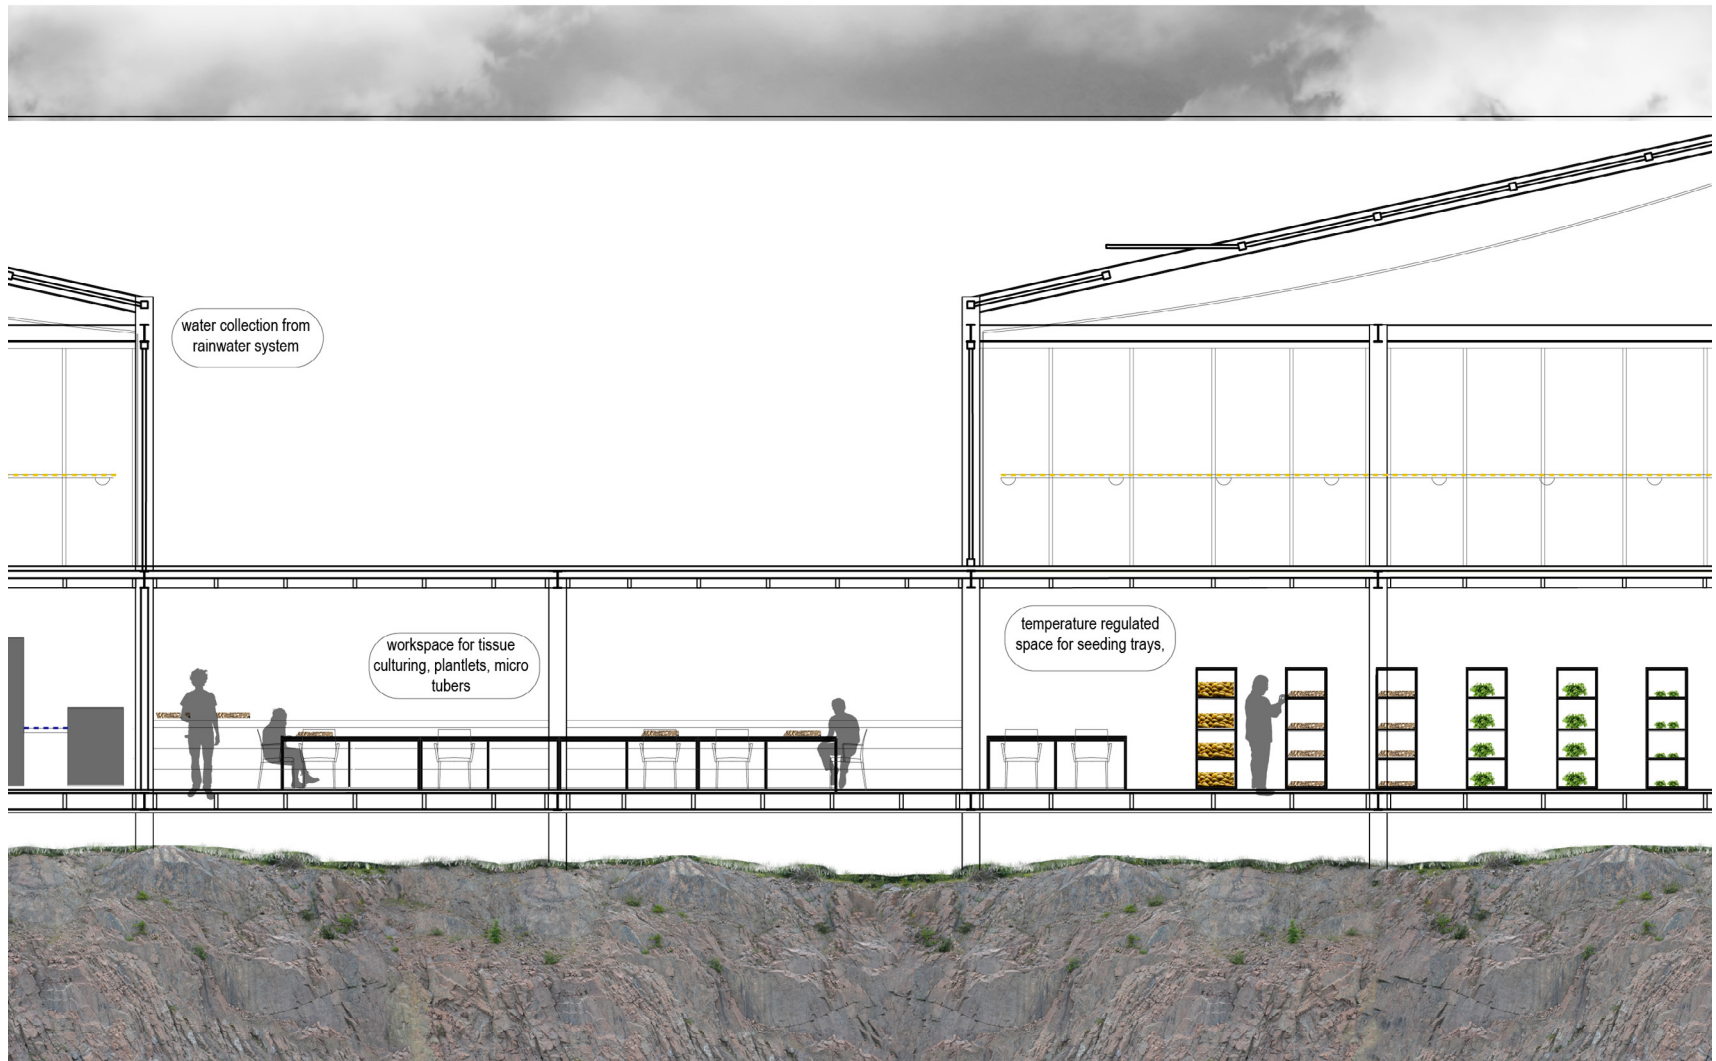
Section 1a: section through soil greenhouse and production rooms
